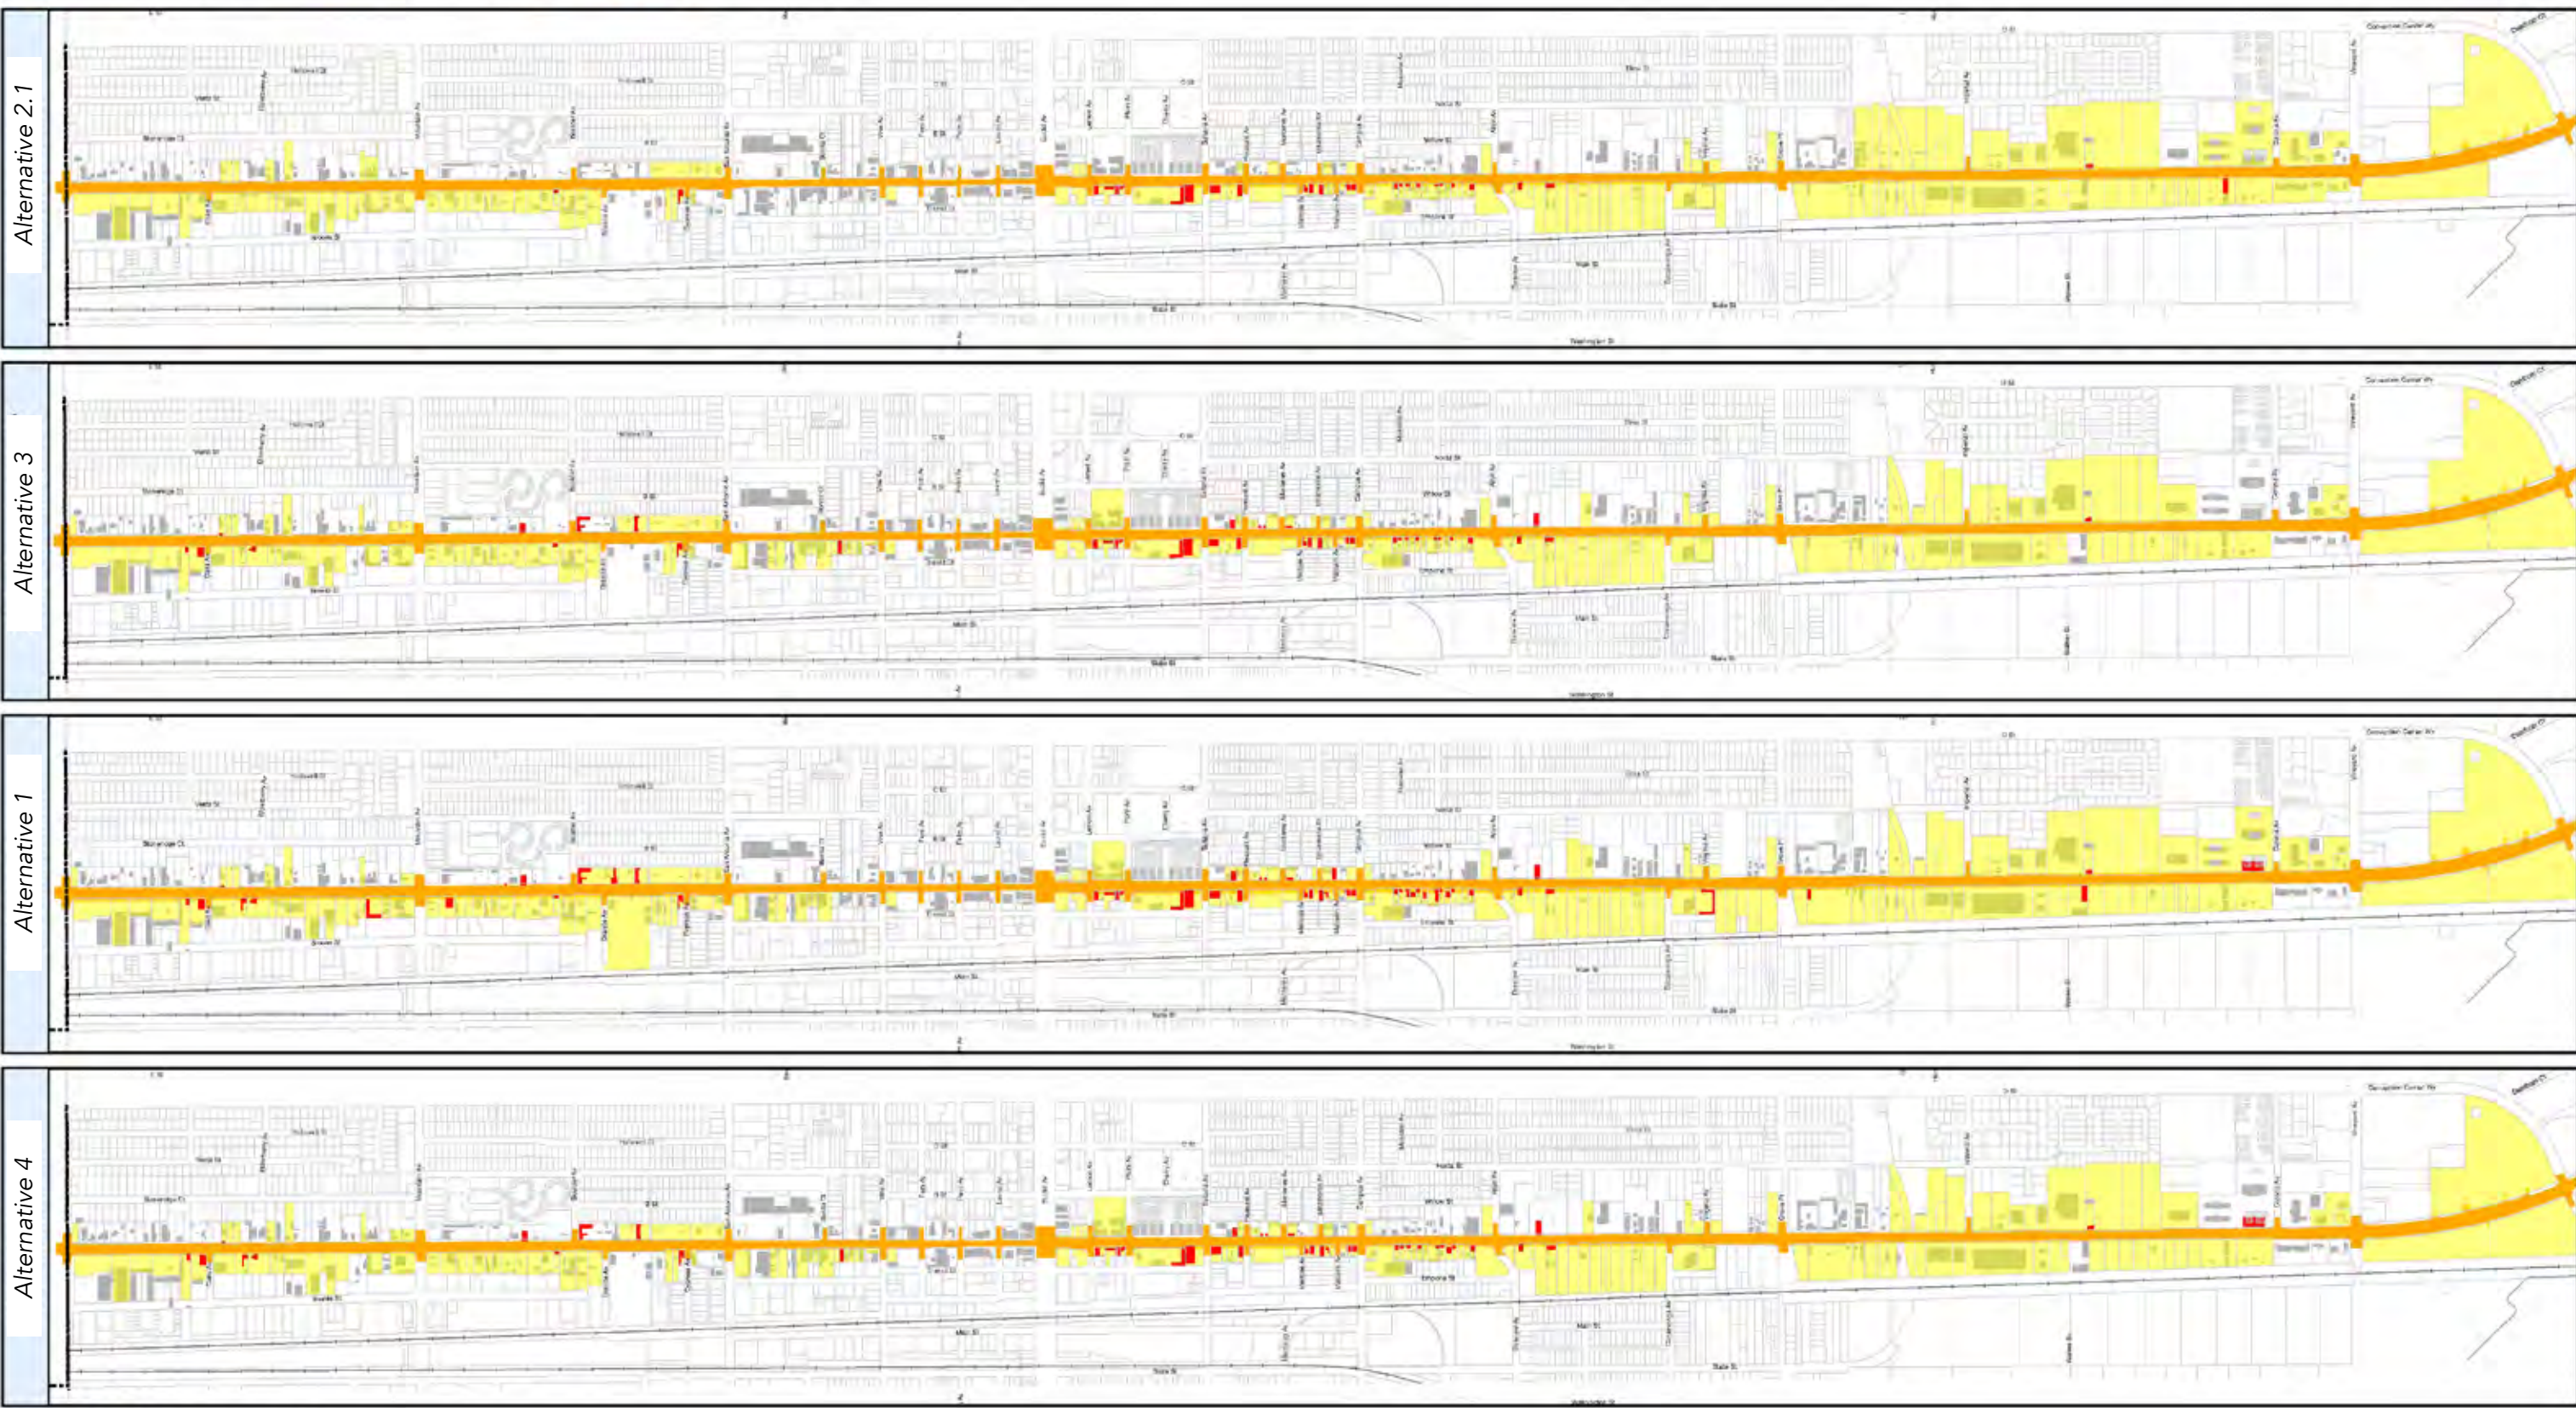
Alternative 2.1 (Refined Alt. 2) : Overall Site Plan Layout
